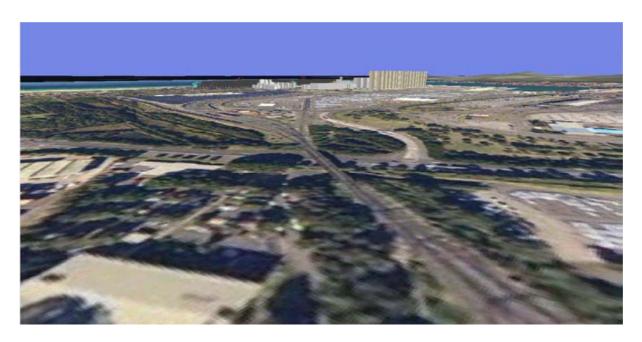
Revised site layout as seen from Vewpoint 2, Robwald Ave
